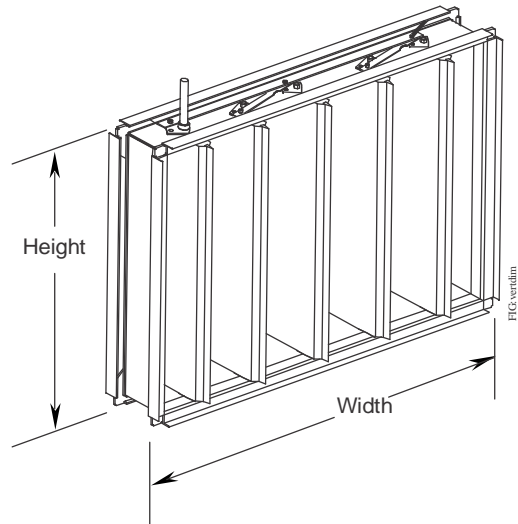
Mounting Dimensions Vertical Blades with Thrust Washers
